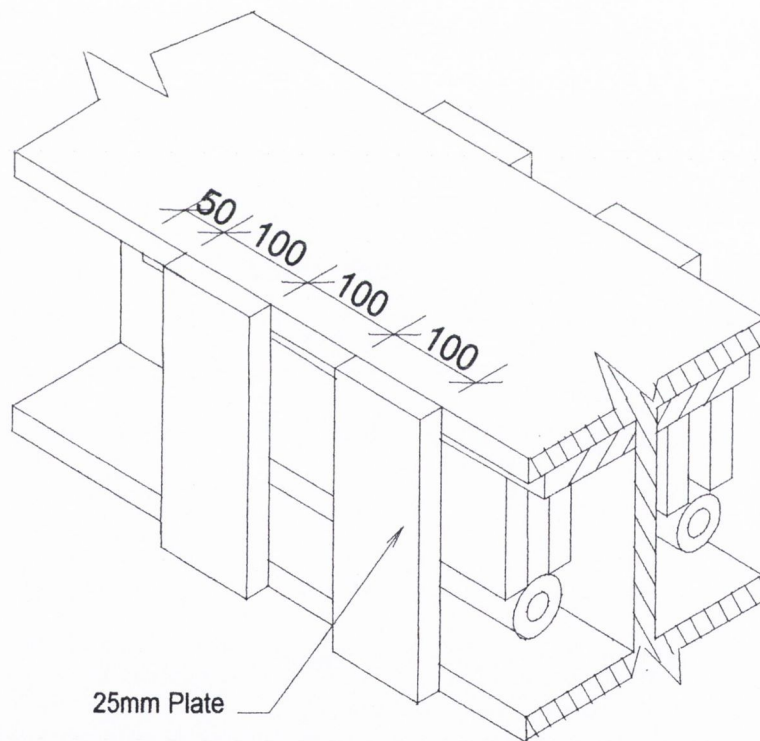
Part-view of the beam with 100mmx25mm stiffeners welded to the outside edges of the upper and lower flanges
